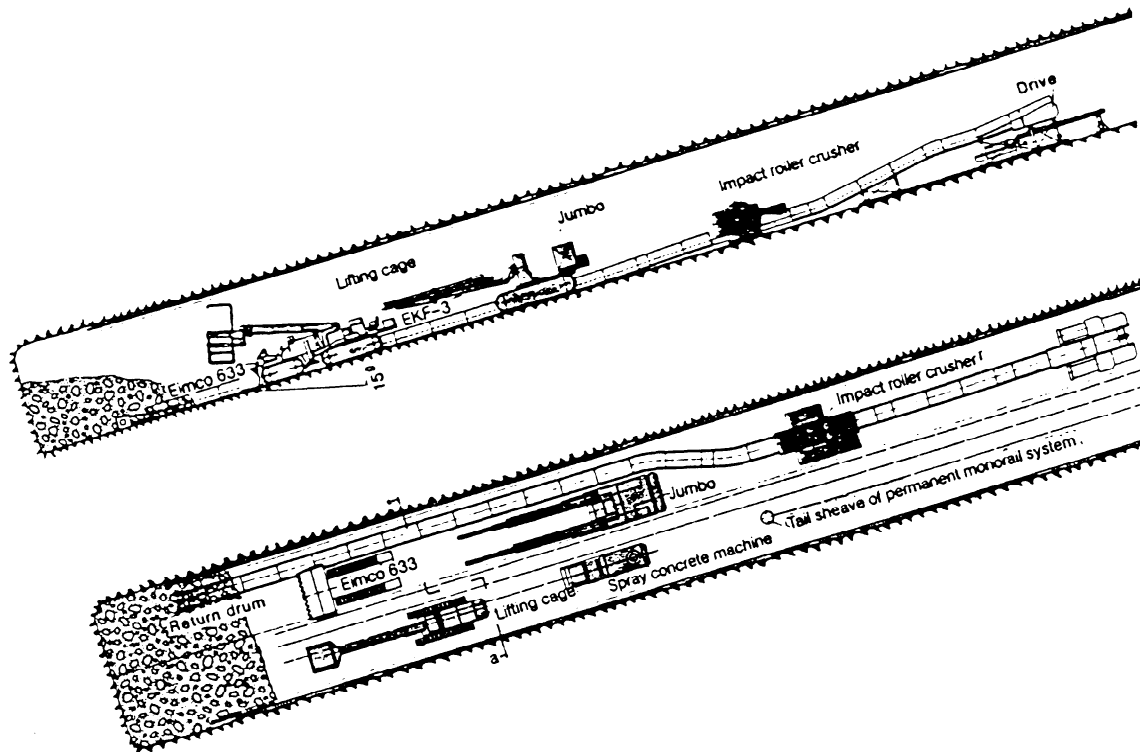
Slope development with conventional drill-and-blast method. Development of a lower level by an incline, face equipment with drill jumbo and side-tipping loader (electro-hydraulic), steel support and sprayed concrete (courtesy: Thyssen Schachtbaus Co.).
